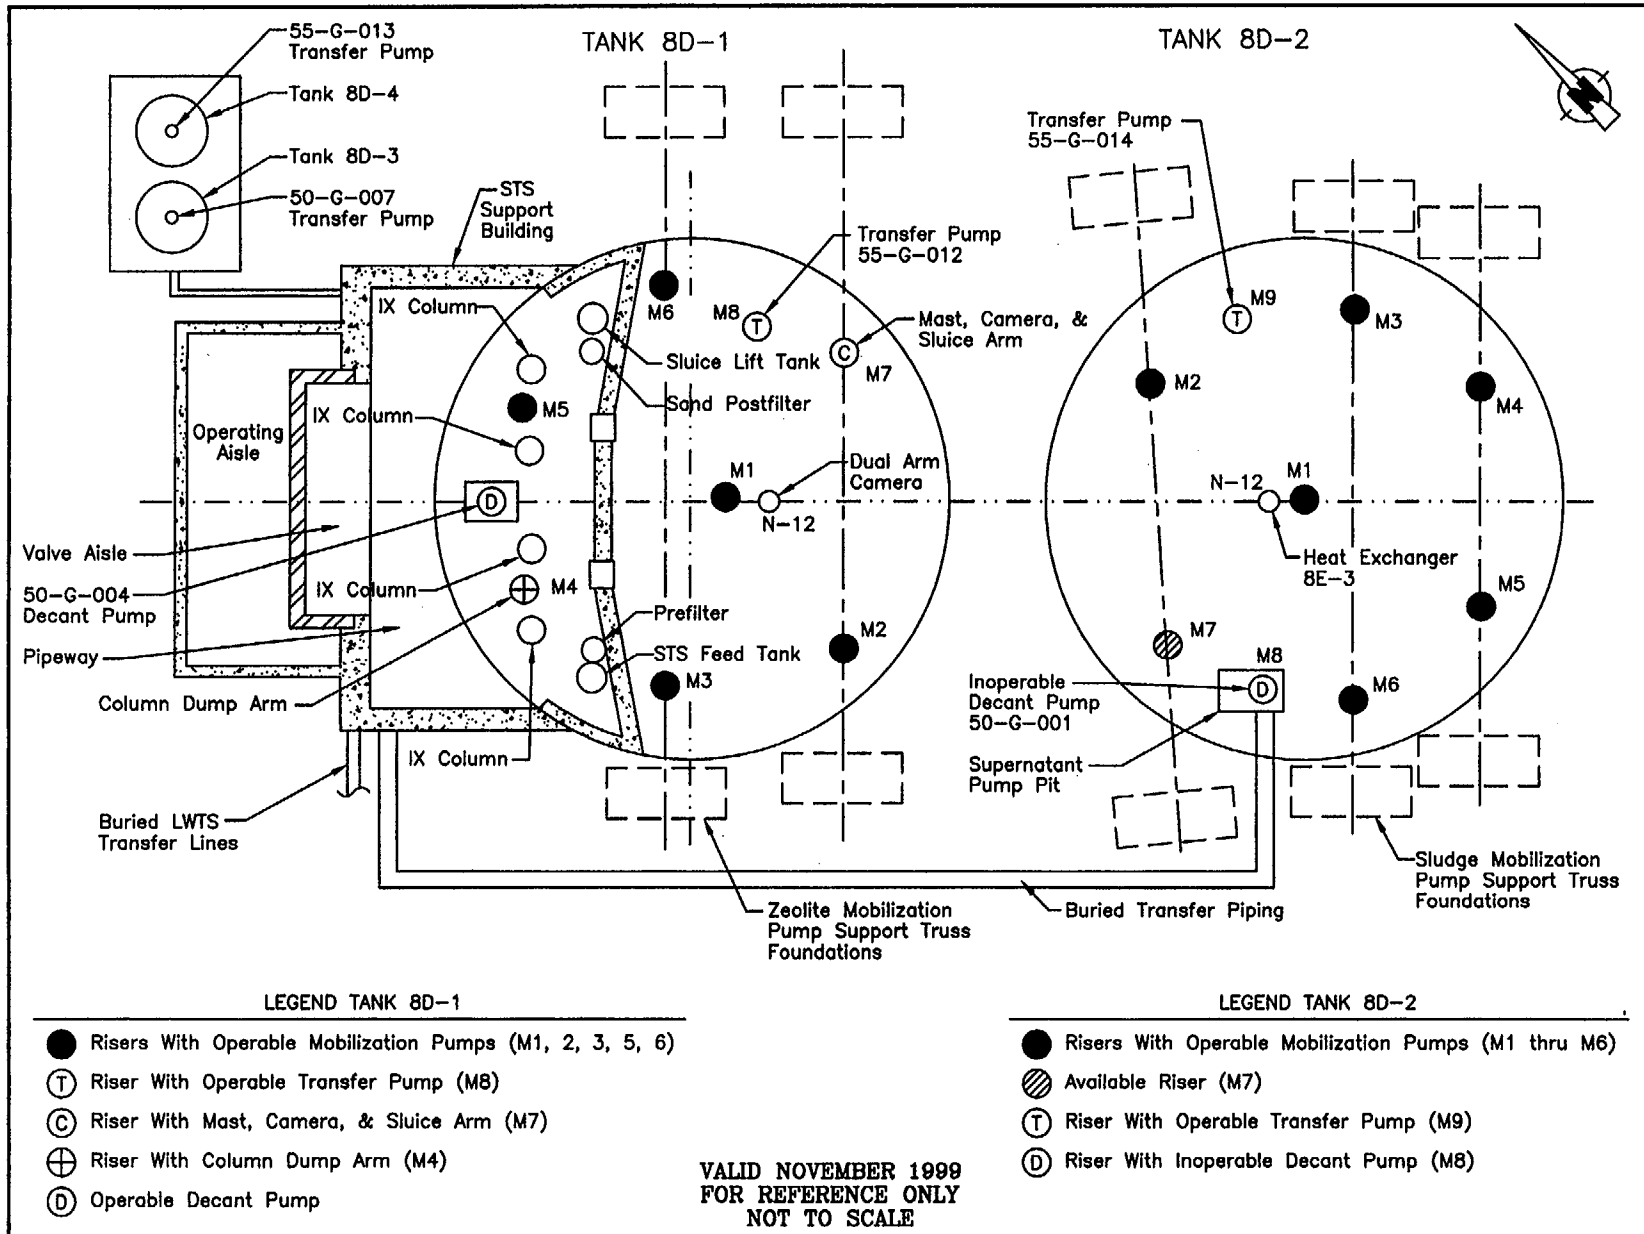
Plan View - HLW Tanks 8D-1 and 8D-2
